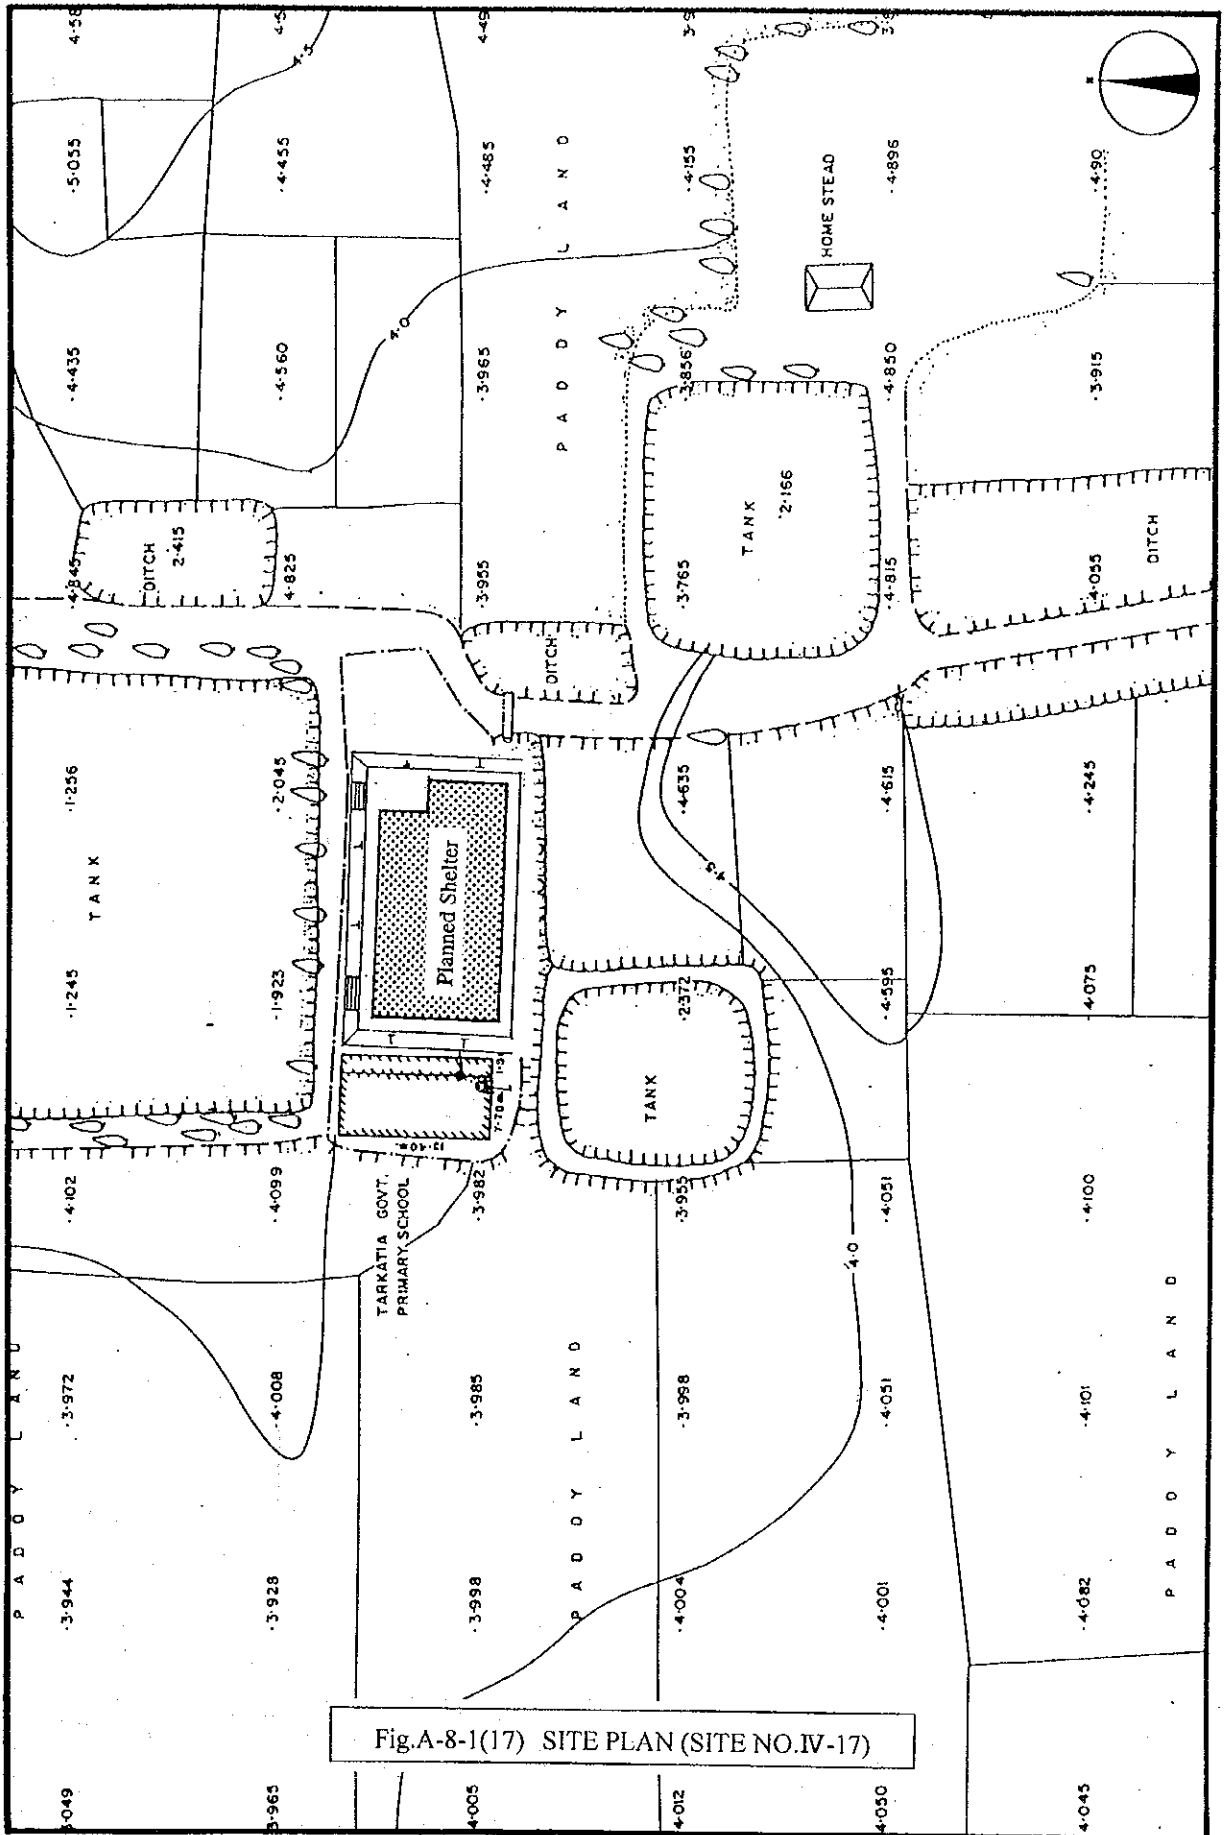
(17) SITE PLAN (SITE NO.IV-17)
